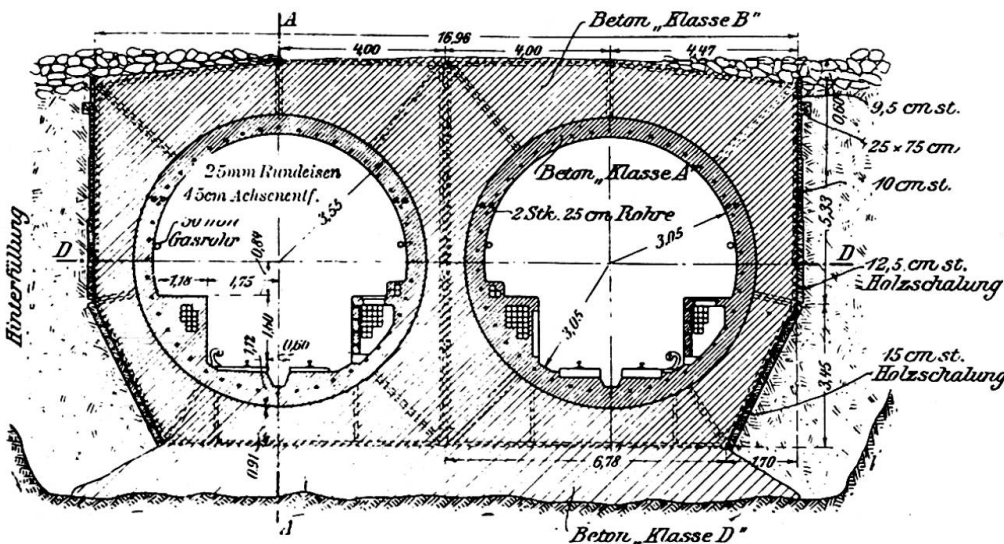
Cross section: Michigan Central Railroad tunnel in Detroit
